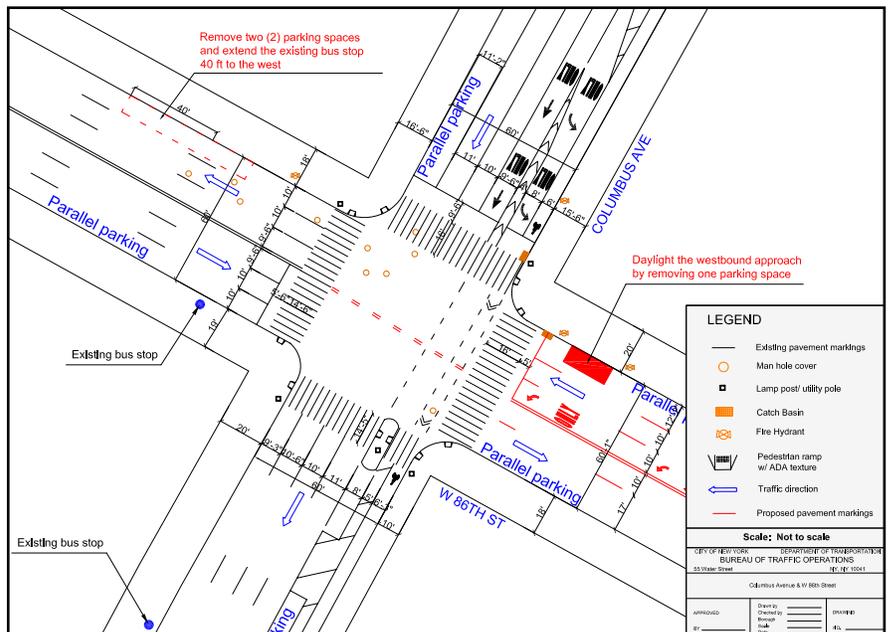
Proposed Condition - West 86th Street & Columbus Avenue
